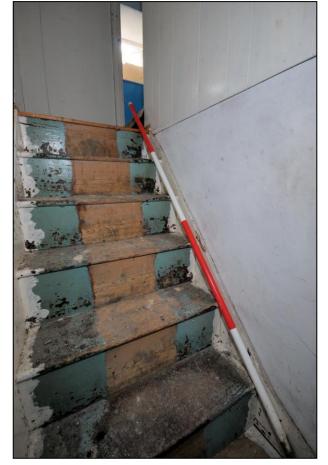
No. 41, stairs, looking up Facing south-east (Scale 2m)
